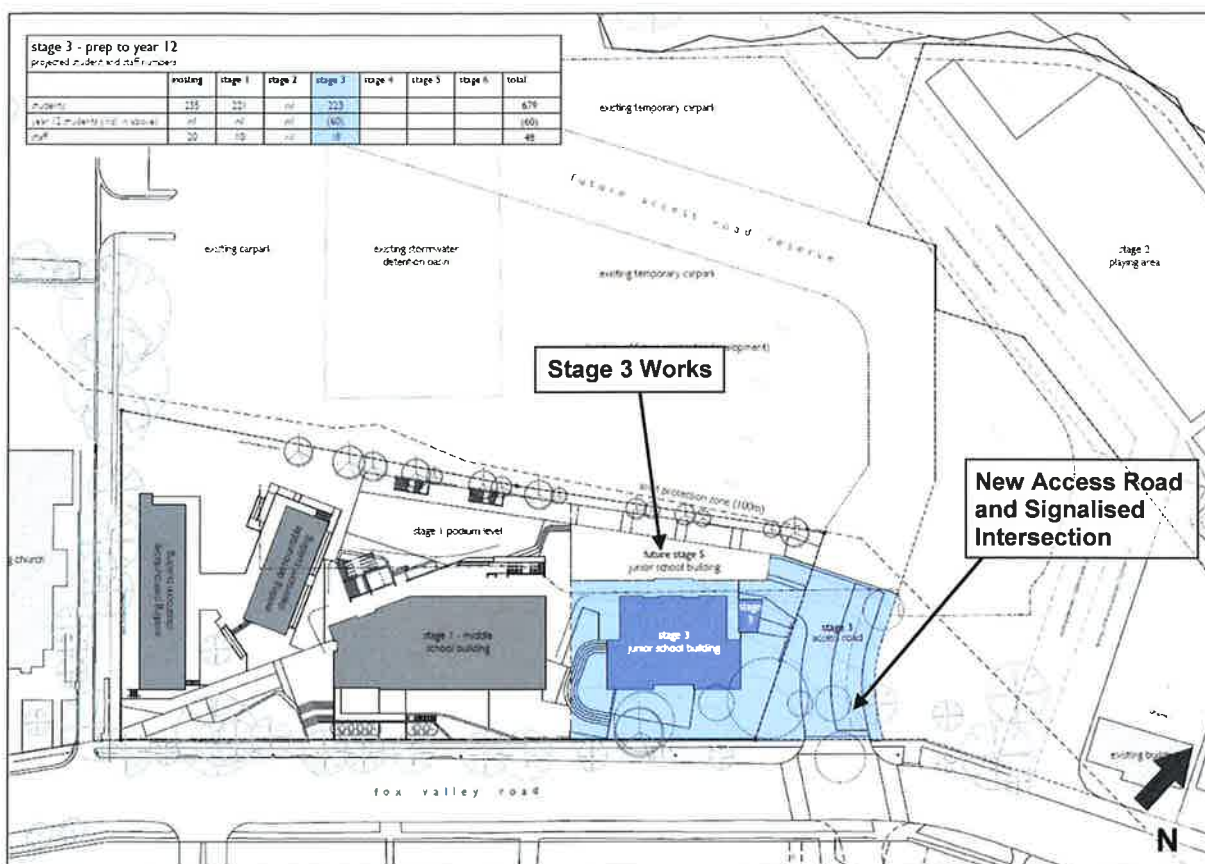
Stage 3 – Junior School Layout (east) and Site Access
